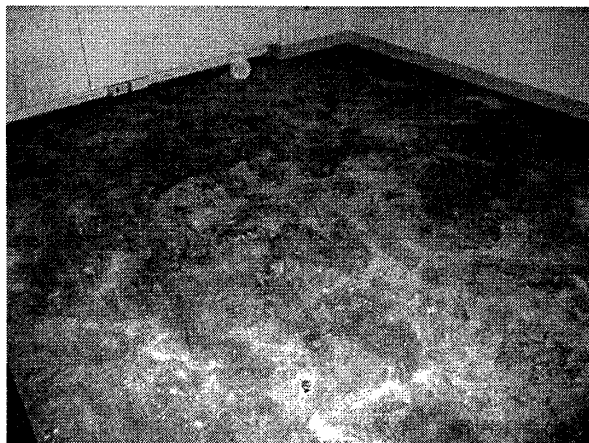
Floor 27 carpet water damage and visible mold
